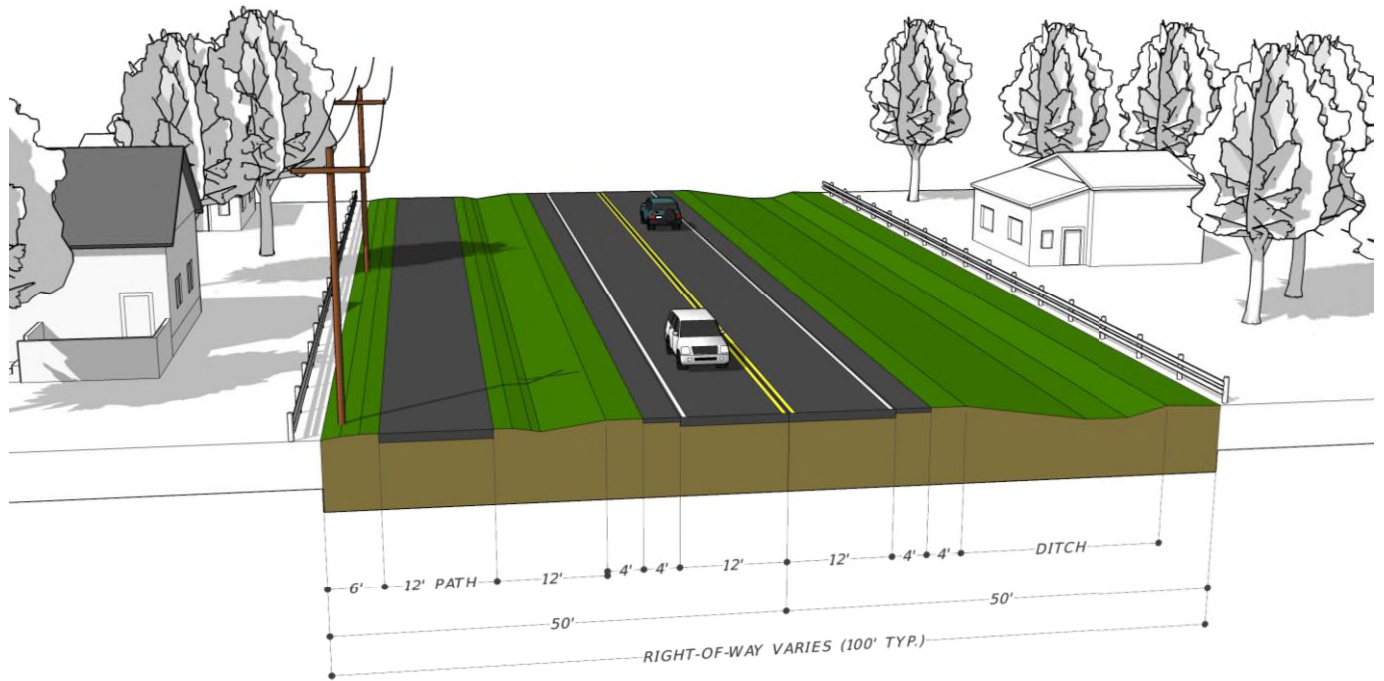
| Typical Section 4A – Very Constrained with Shoulder Gutter
